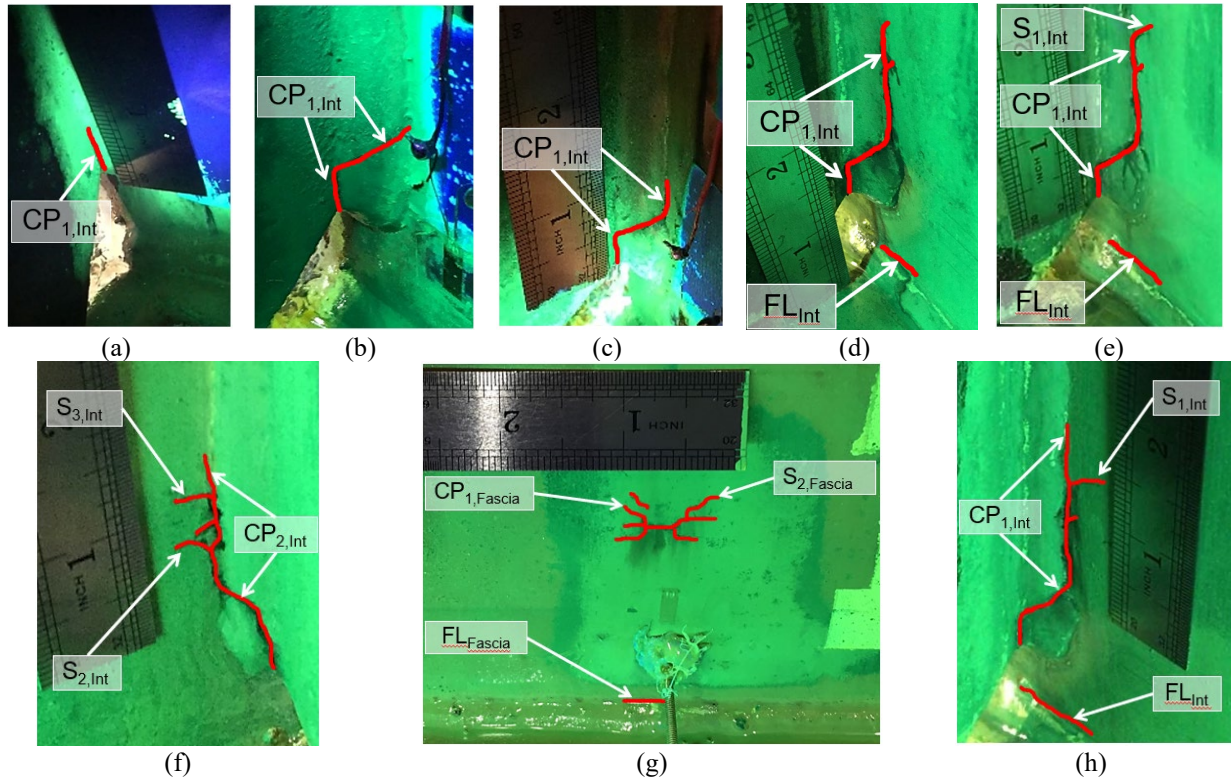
Crack pattern during Trial 1: (a) Interior of the girder, north side of CP at 6,500 cycles; (b) Interior of the girder, north side of CP at 12,600 cycles; (c) Interior of the girder, north side of CP at 17,000 cycles; (d) Interior of the girder, north side of CP at 29,000 cycles; (e) Interior of the girder, north side of CP at 37,800 cycles; (f) Interior of the girder, south side of CP at 47,000 cycles; (g) Fascia side at 47,000 cycles; (h) Interior of the girder, north side of CP at 47,000 cycles
